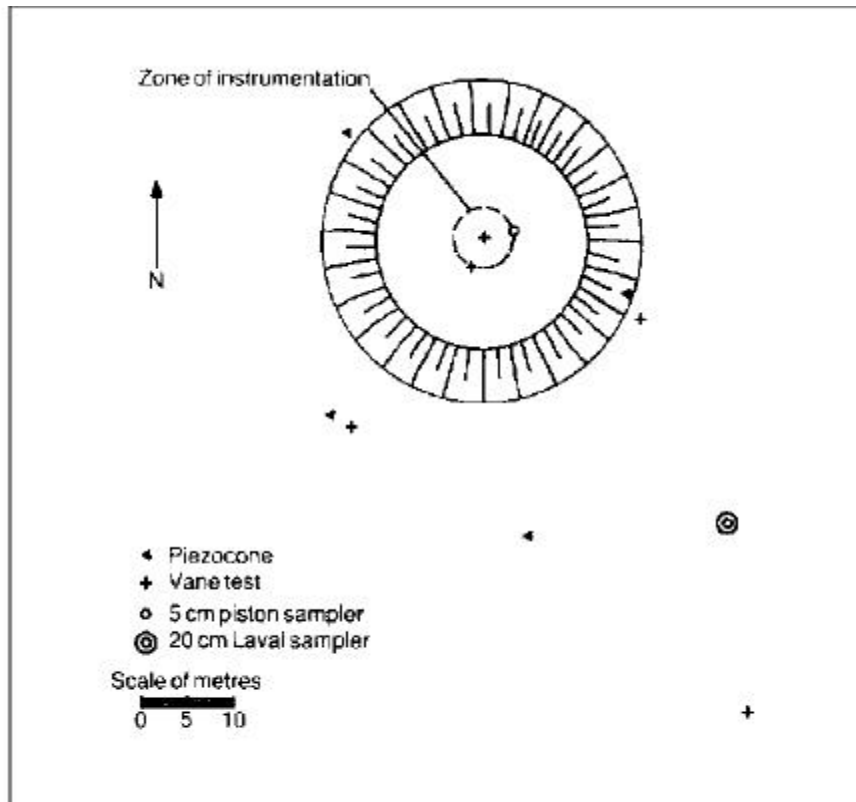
Instrumentation and geotechnical exploration layout at the Berthierville test fill (from Kabbaj et al, 1988)
